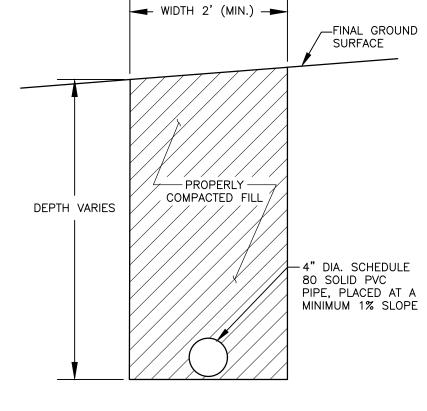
PIPELINE TRENCH CEMENT SOIL BACKFILL NOT TO SCALE
